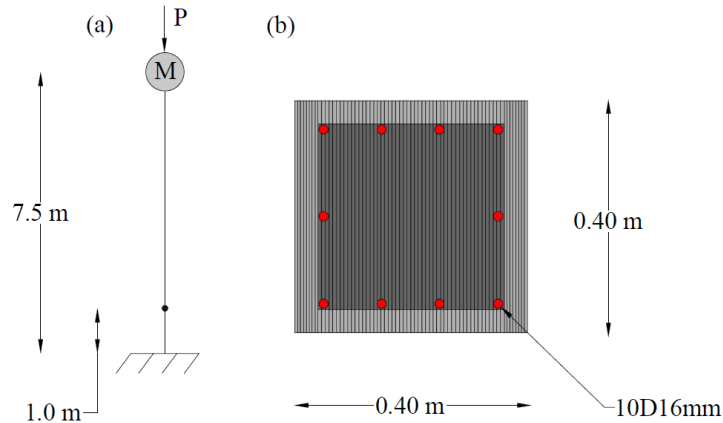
(a) Cantilever reinforced concrete column modelled with two corotational force-based elements. (b) Fibre cross-section of the column.
